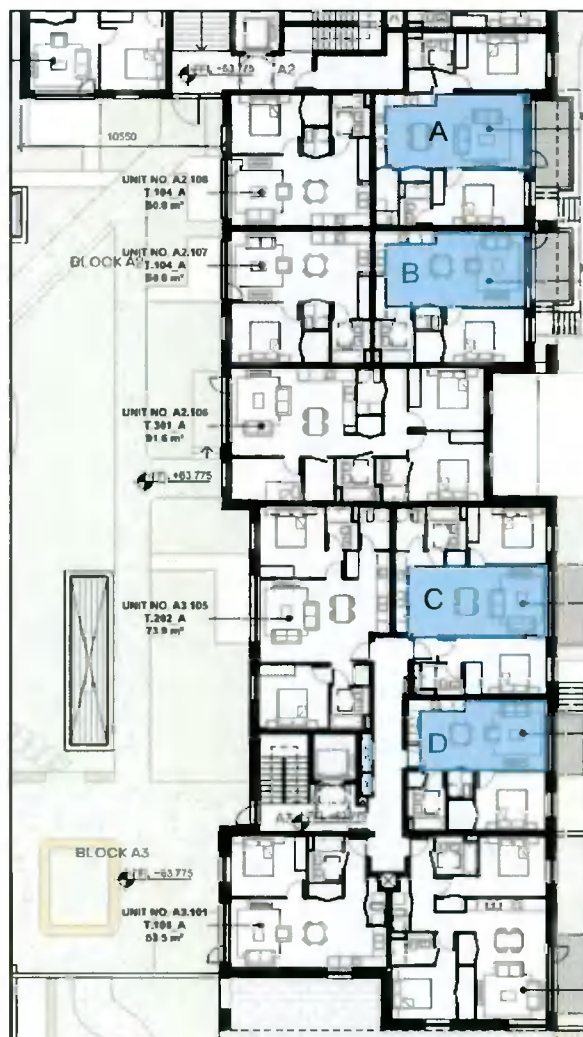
Block A – First Floor (East) Assessed Rooms Highlighted in Blue
